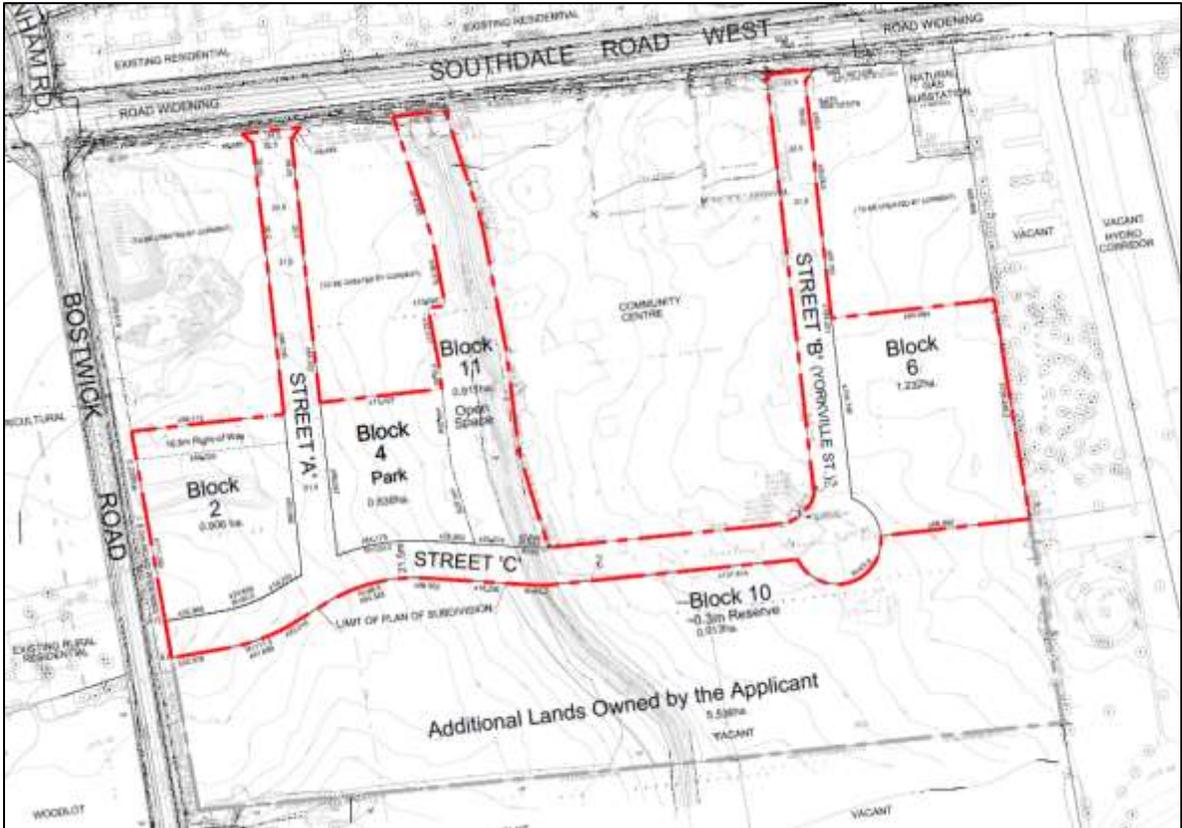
Proposed Draft Plan of Subdivision 39T-18502
